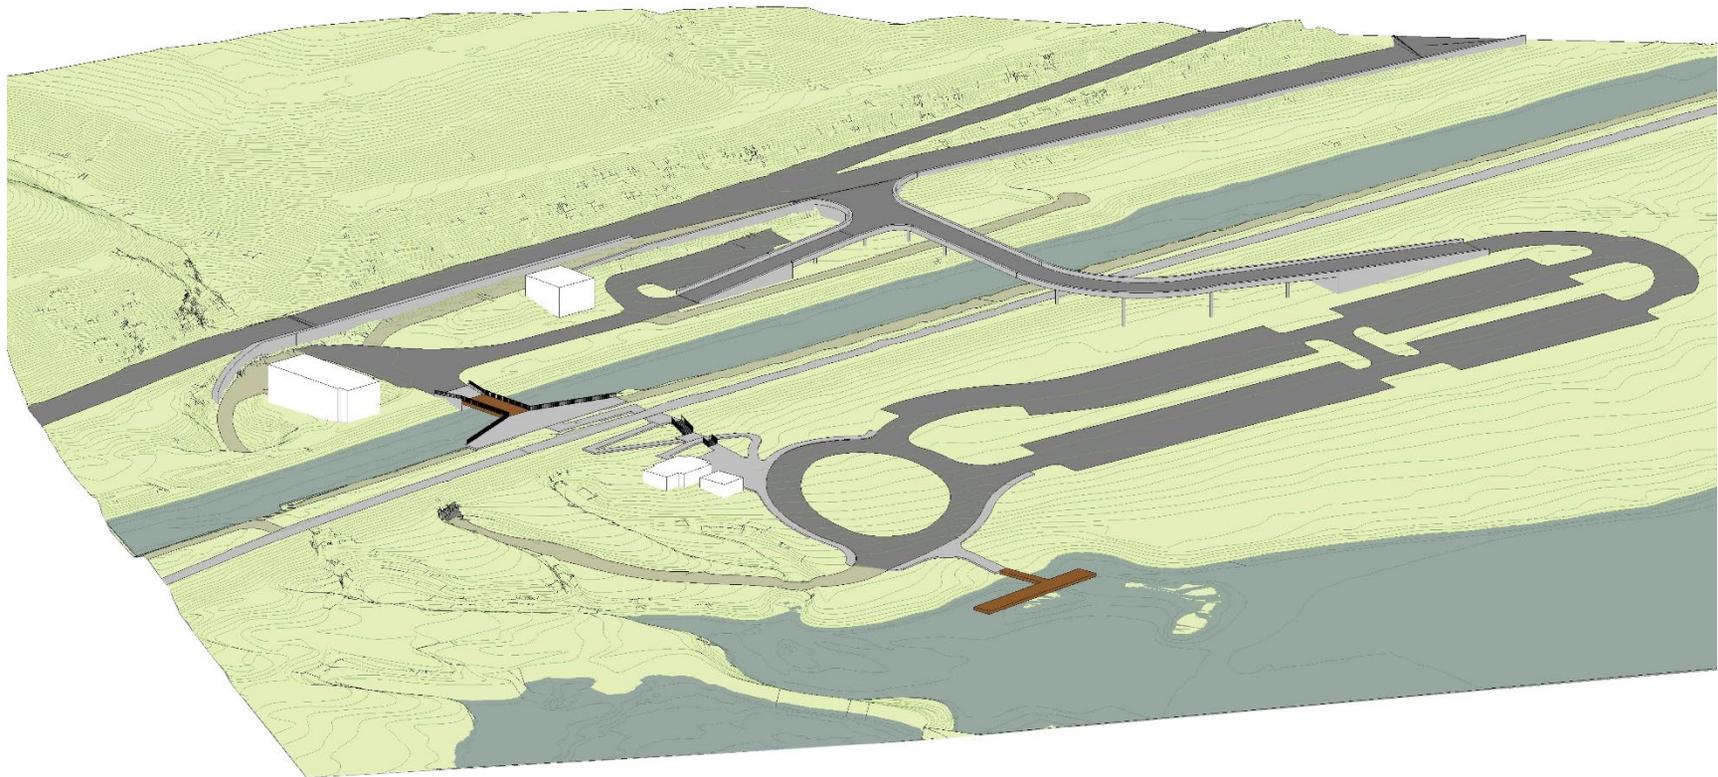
Axonometric View of Upper and Lower Parking Lot Access Alternative (Alternative C)
